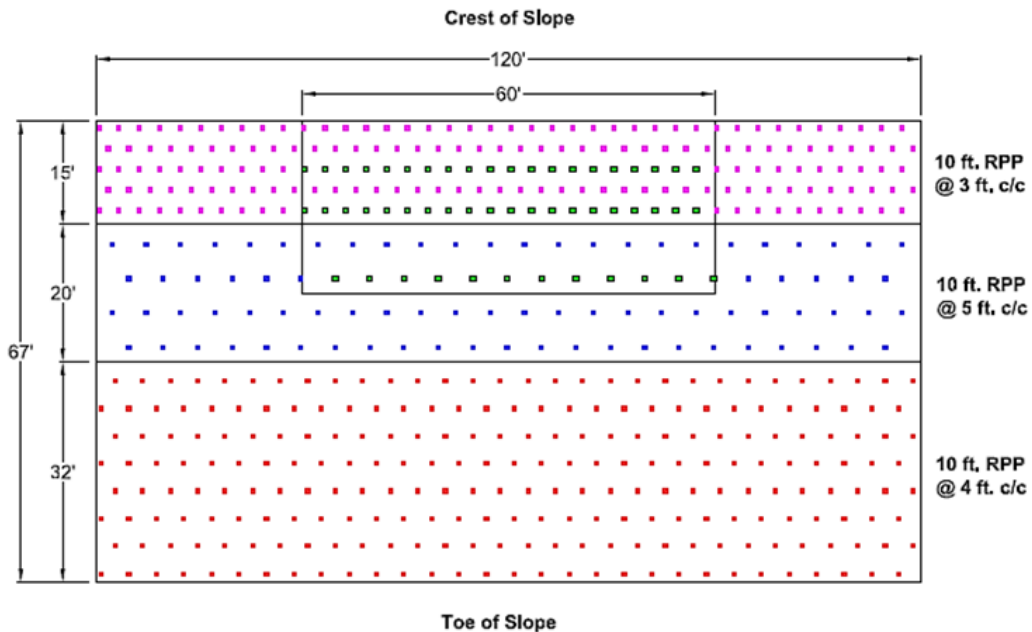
Proposed RPP Layout at IH-820 & Rosedale Street.
